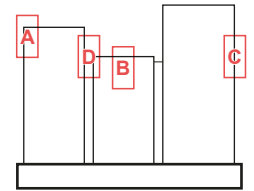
Detailed Elevation D - Balcony Insets
